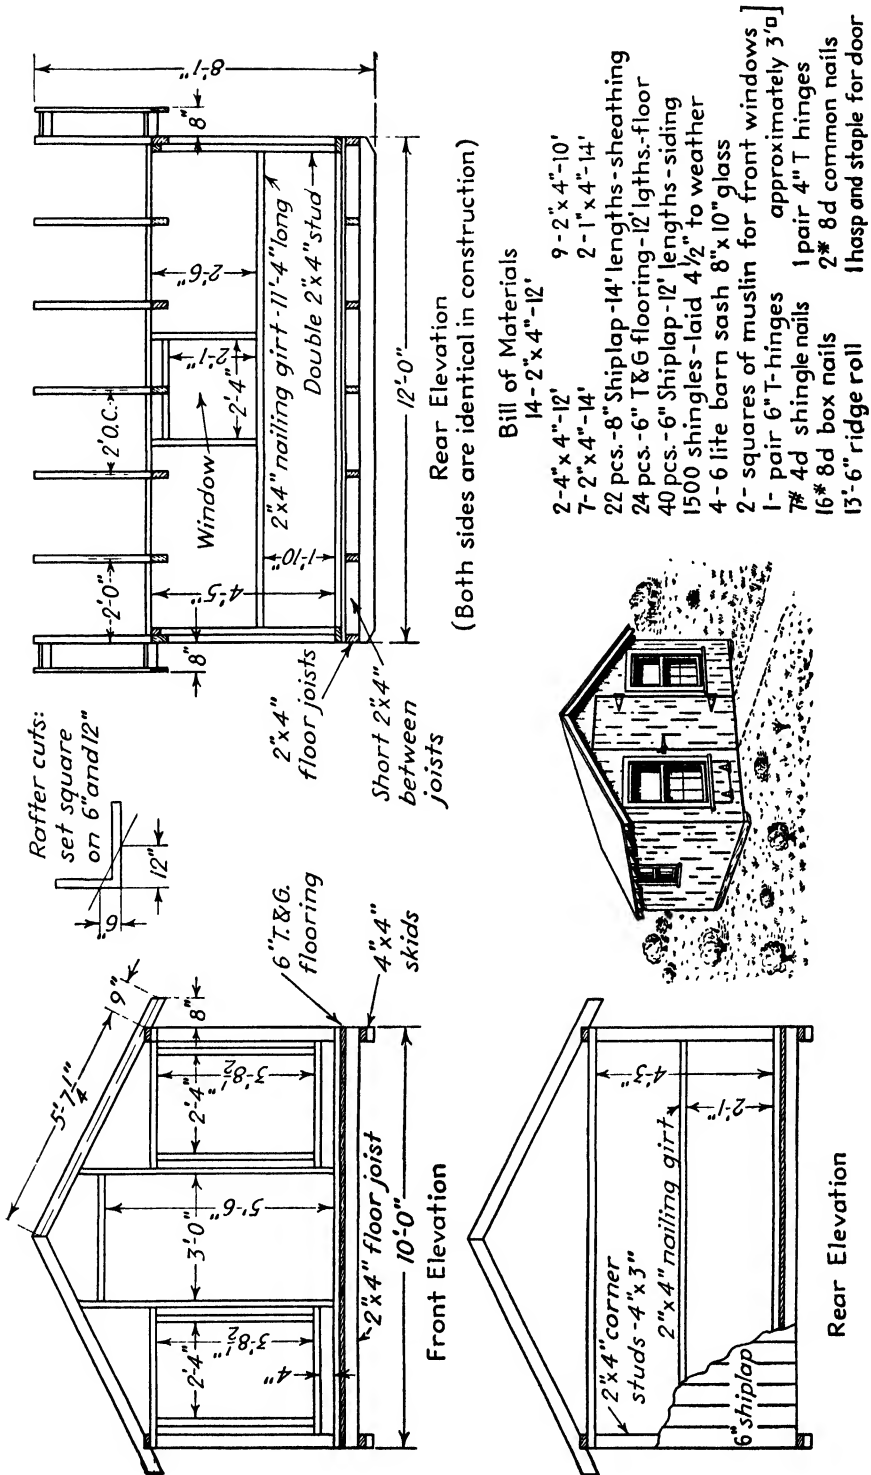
Plans for a 10- by 12-ft brooder house.
